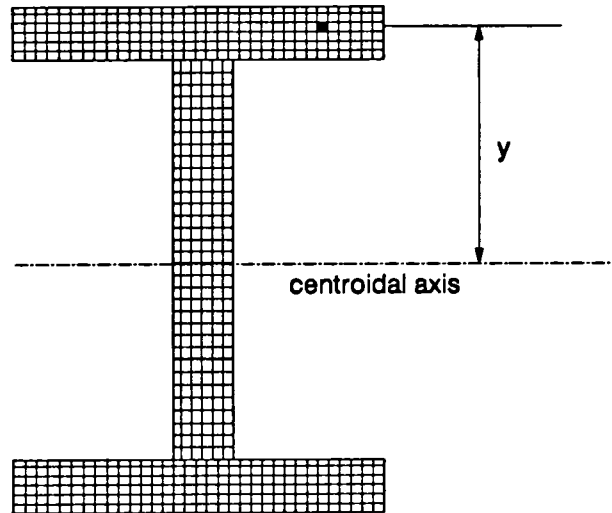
Dividing the cross-section for calculating the properties of the section.
